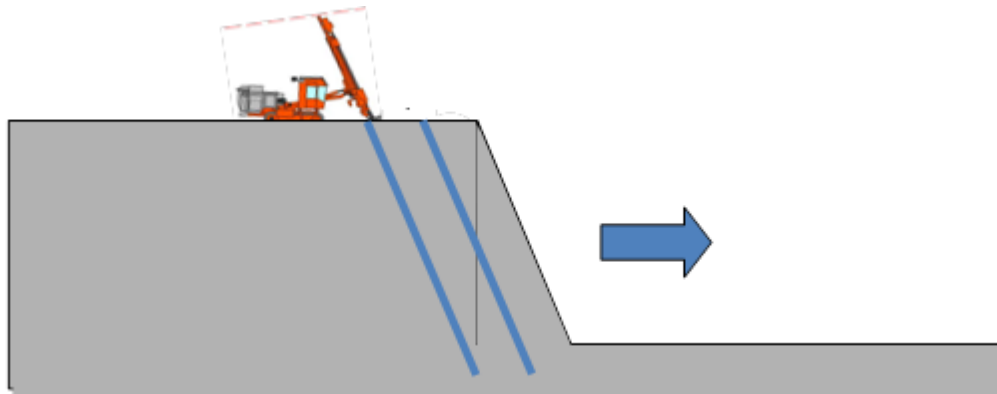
Inclined bench drilling, most common way in bench drilling (*Olsson, R. 2012*).
